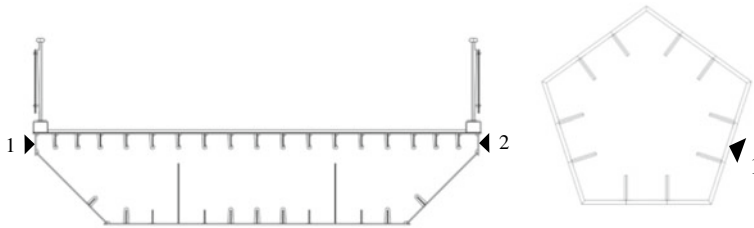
Layout of geometry monitoring points of beam and arch sections
